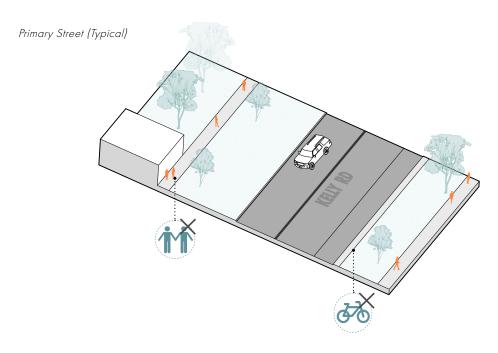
Key plan of the street types in Denby.
